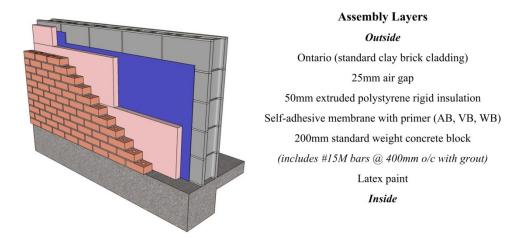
Assembly Layers for Concrete Masonry Unit Wall #1 (CMU-W1)
